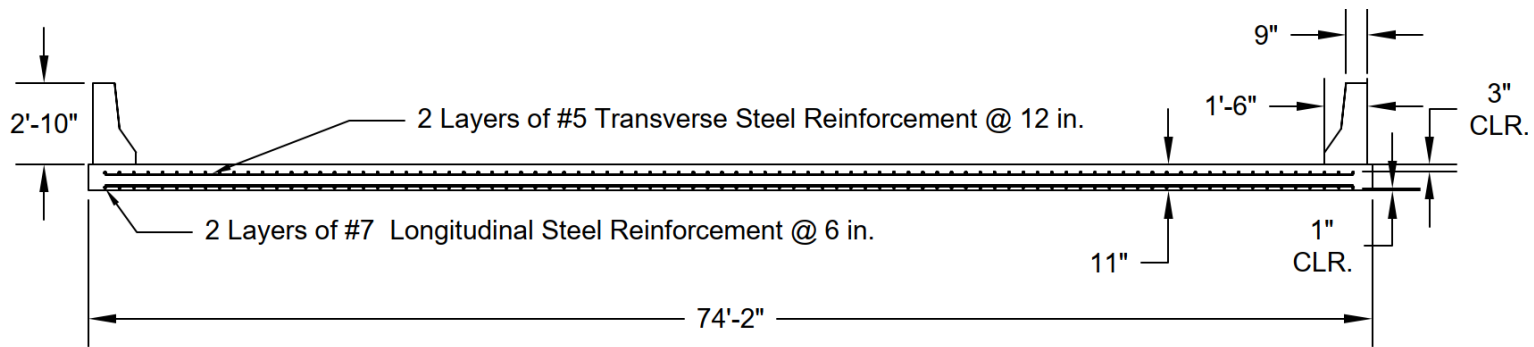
Cross-sectional view of the secondary slab-span bridge (Bridge 27925).
